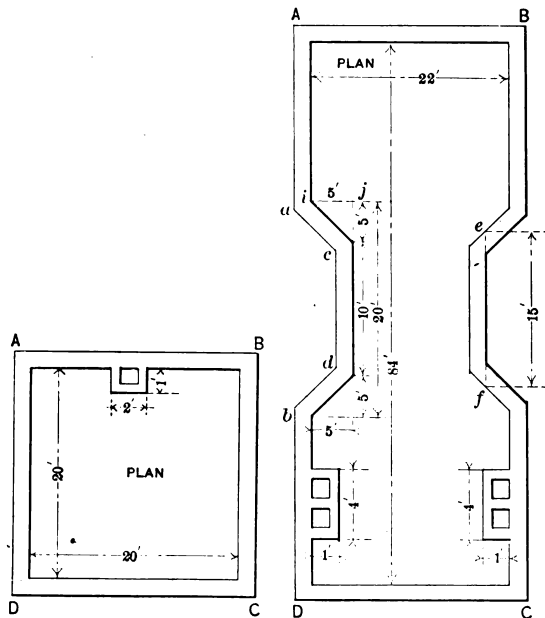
Plan of Square Roof. Fig. 2.—Roof of Building with Air Shafts at the Sides.
